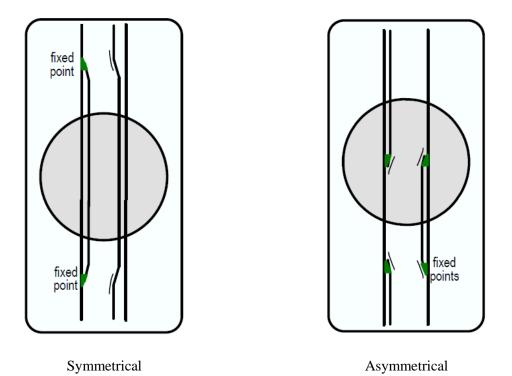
Typical multi gauge turntable layout schemes [14]
